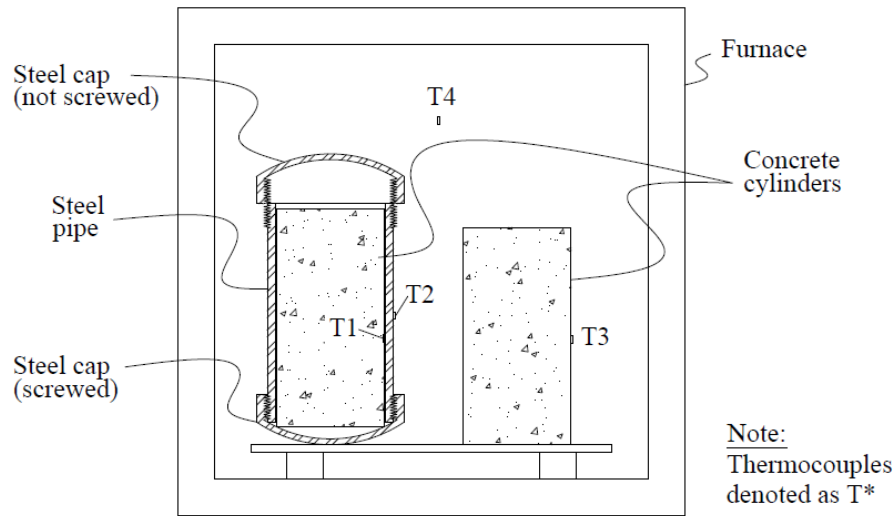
Steel pipe and steel caps used for sealed heating
